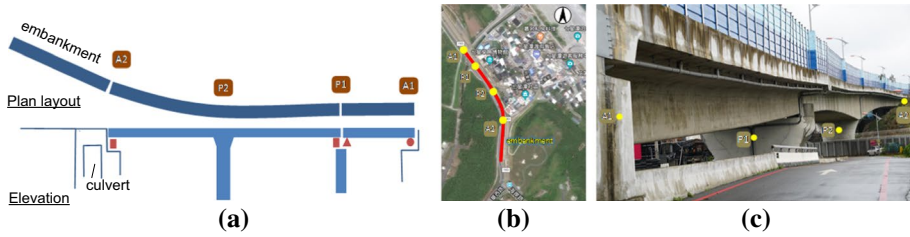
Qixingtan Bridge: a diagrams of the plan and elevation layouts, b satellite image, and c photograph
